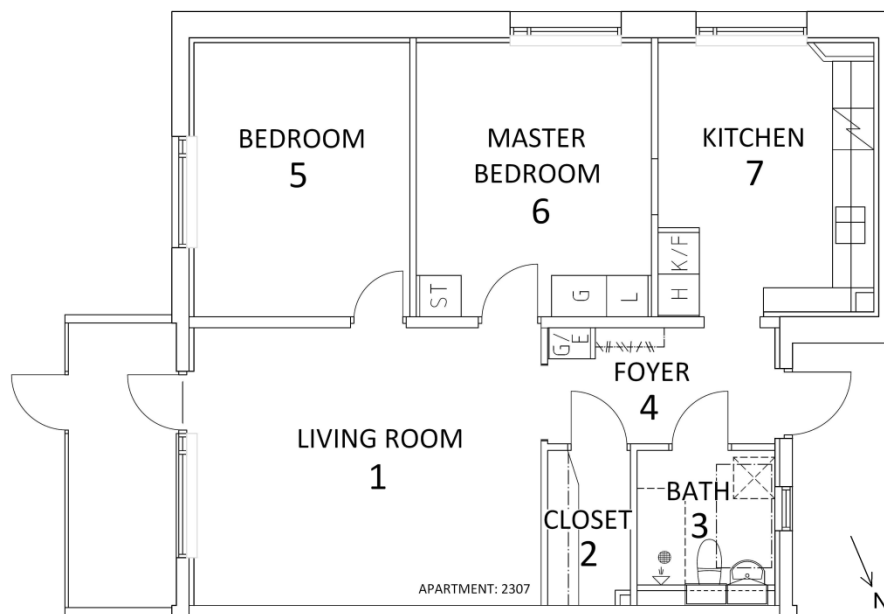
Plan drawing of the apartment which is part of the chosen building located in Märsta, Stockholm. The Total residential floor area is 70.9 m<sup>2</sup>. Supply air devices are placed in the bedrooms and living room (1, 5, and 6) and extract air devices are located in the bathroom (3) and kitchen (7).
